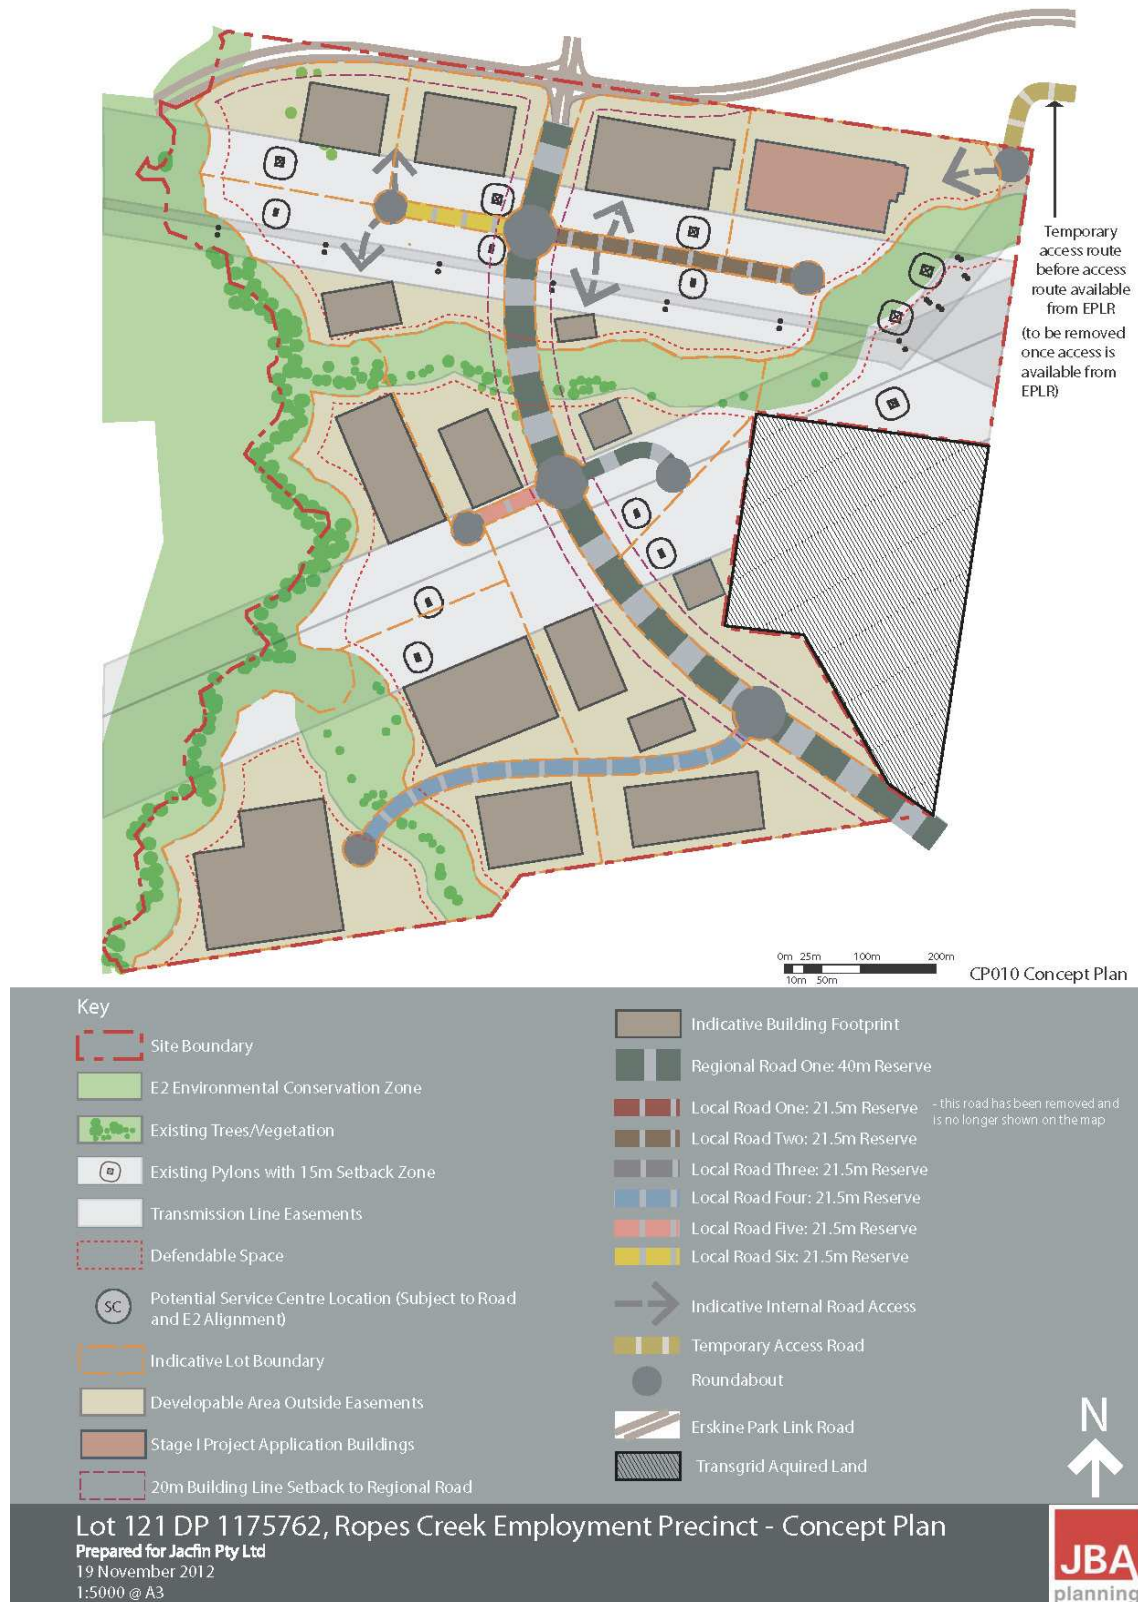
Revised Concept Plan showing Transgrid Acquired Land
